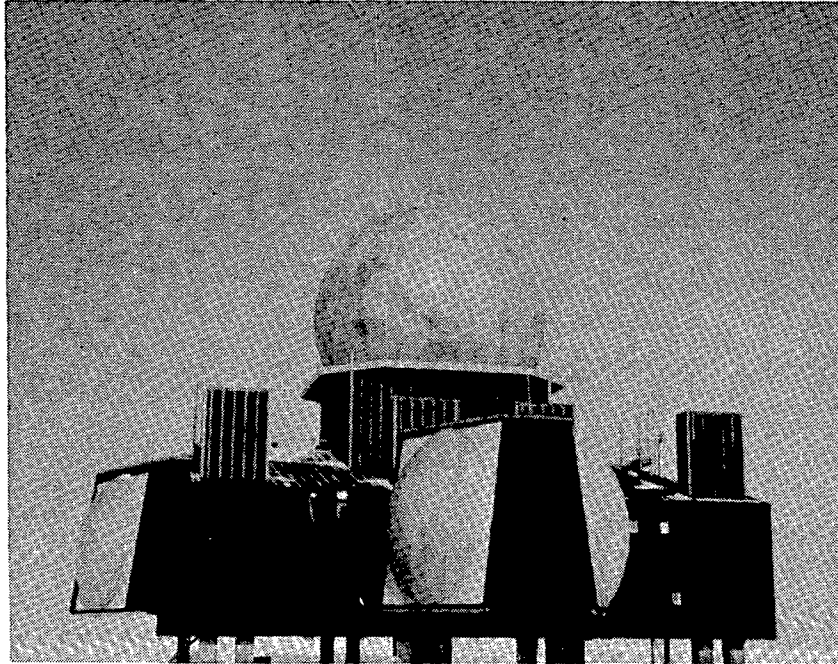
Composite building at Dye II. Note columns projecting above roof.
